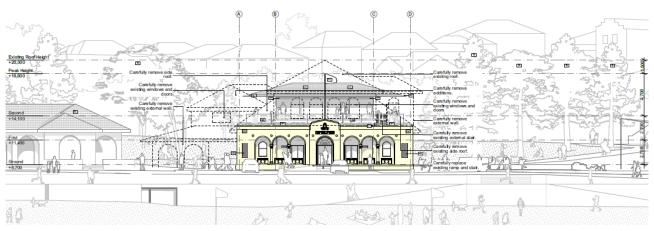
Existing south elevation – proposed demolition. Source: Lockhart-Krause Architects, 2021
